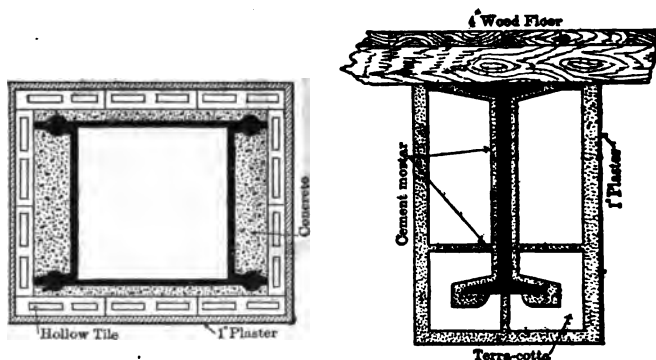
Fireproofing of Steel Columns and Beam with Tile
